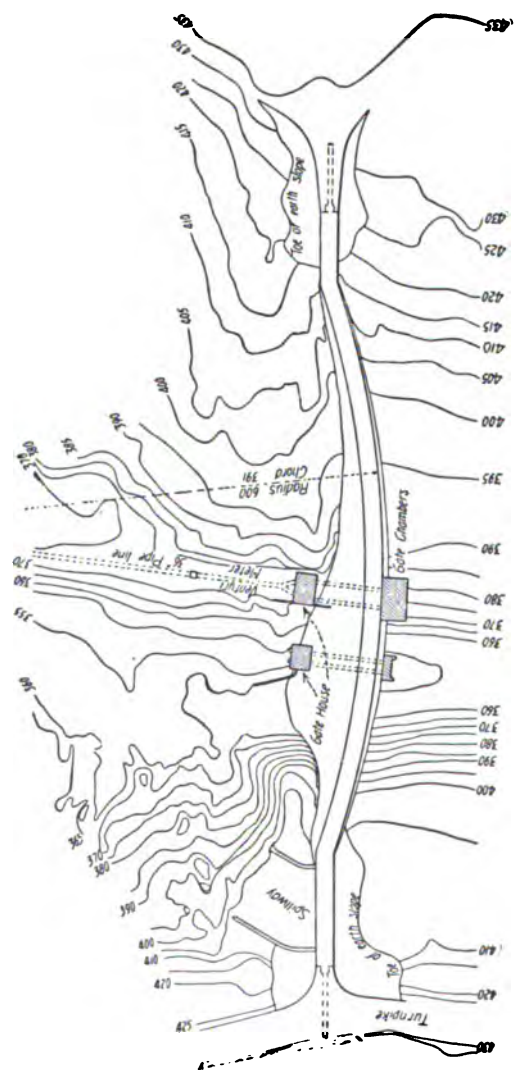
PLAN OF WIGWAM DAM, CONNECTICUT.
